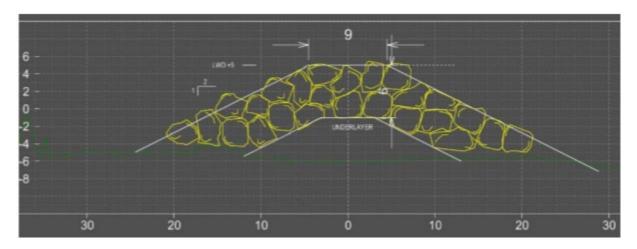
Typical cross-section, East Pier, St, 3+00 - 5+25
